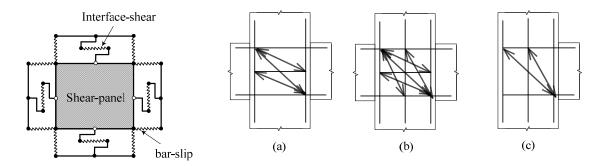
Component-based beam-column Fig. 2 Different strut configurations used in previous researches on the joint model STM
